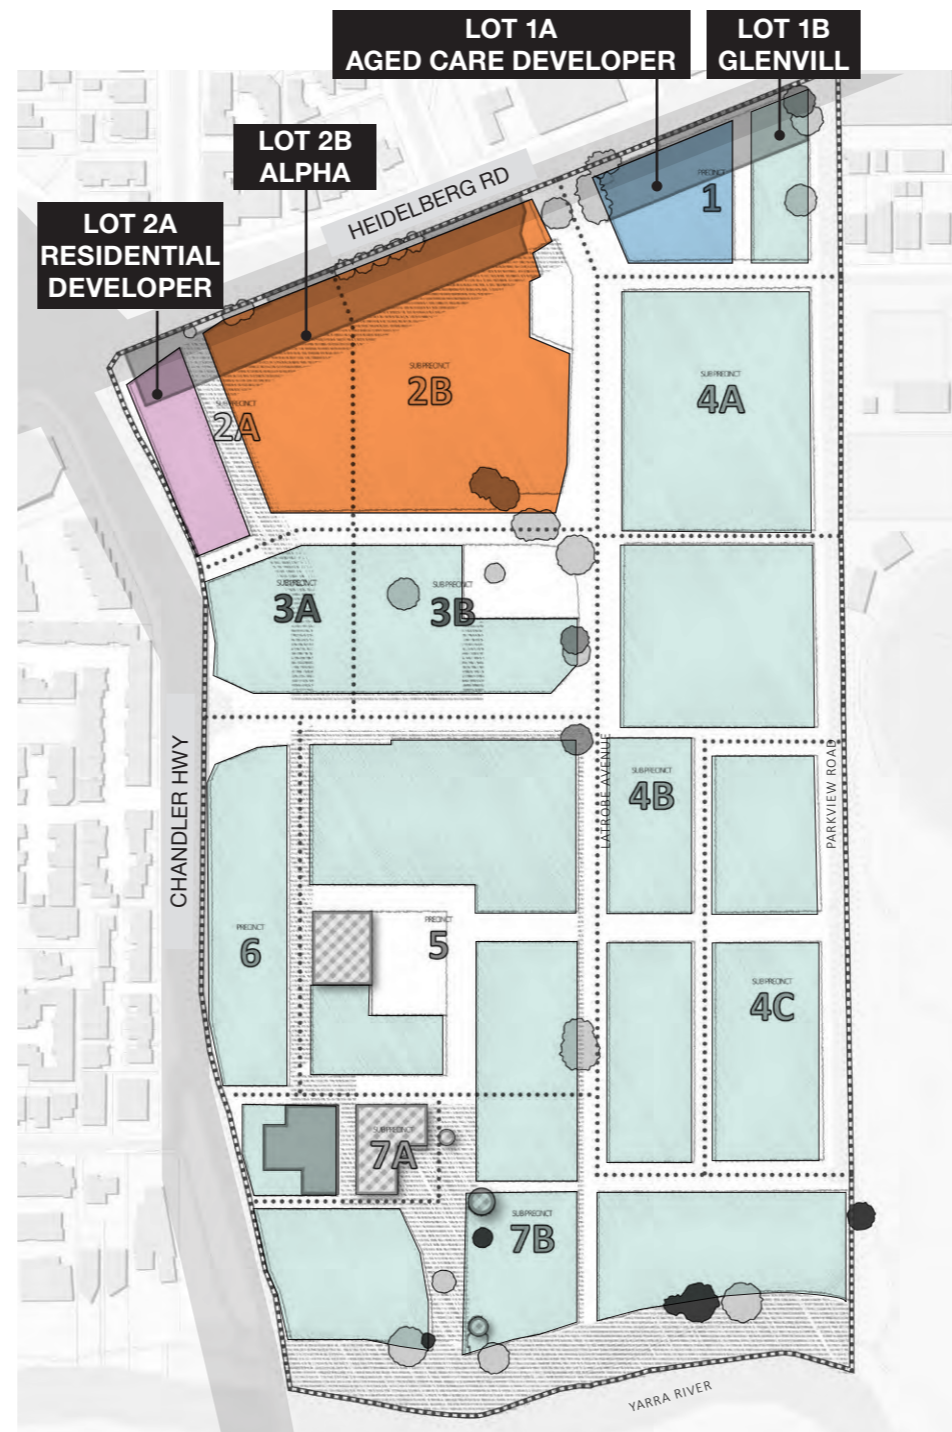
Alphington Paper Mill Development Site Plan
